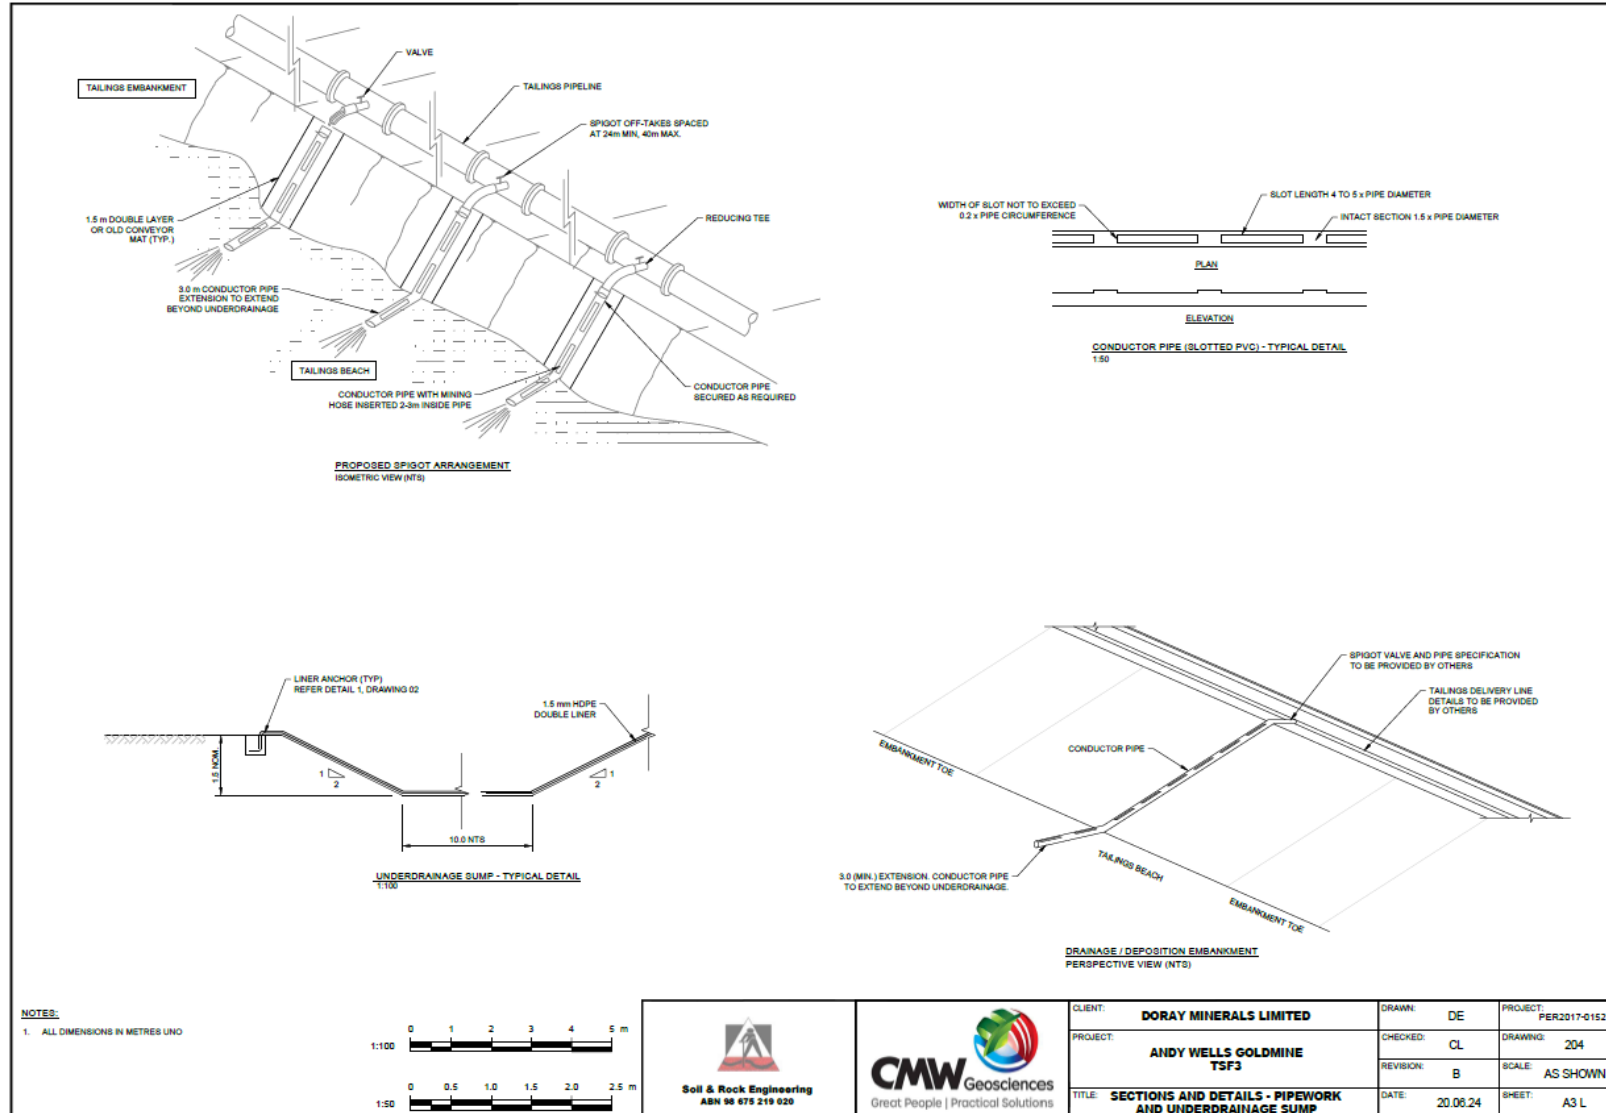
Sections and details – Spigot pipework arrangement and underdrainage sump
